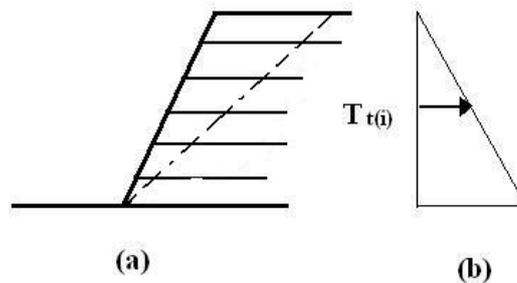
(a) Reinforced slope and failure wedge; (b) force distribution in reinforcements along the height
